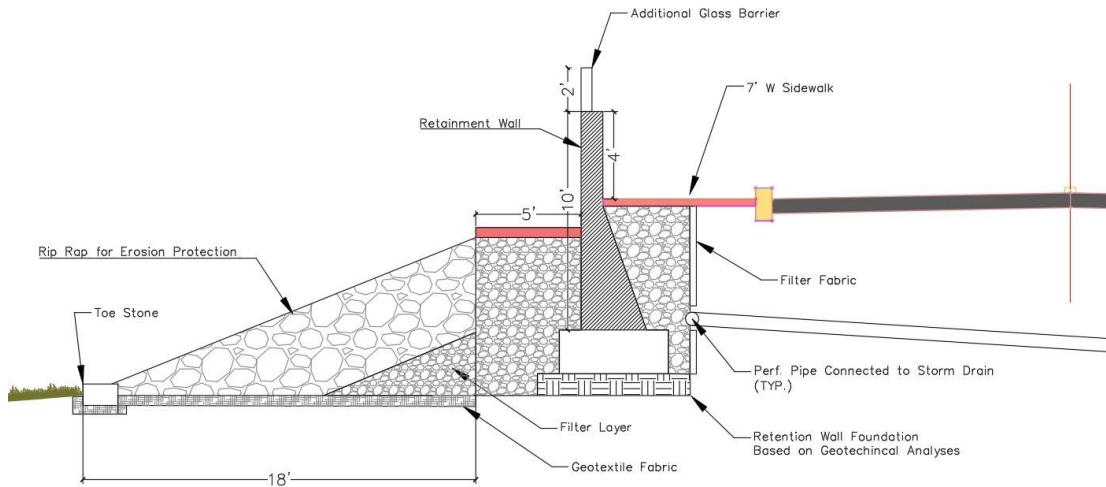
CAD Drawing - Replaced Wall, Rock Revetment, Extended Urban Wild Walkway
